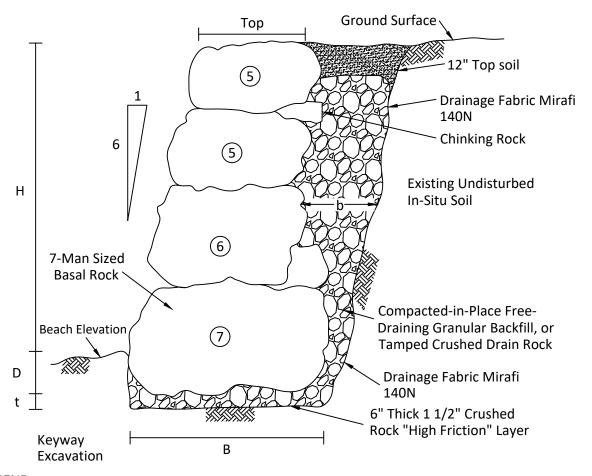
Geotechnical Exploration Plan Figure 3 Typical Rock Bulkhead Section
